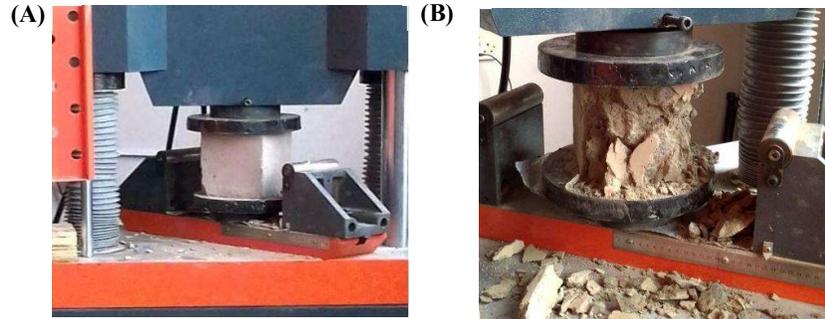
Compression testing of (A) concrete specimens, (B) concrete specimens' continuous pressure.
